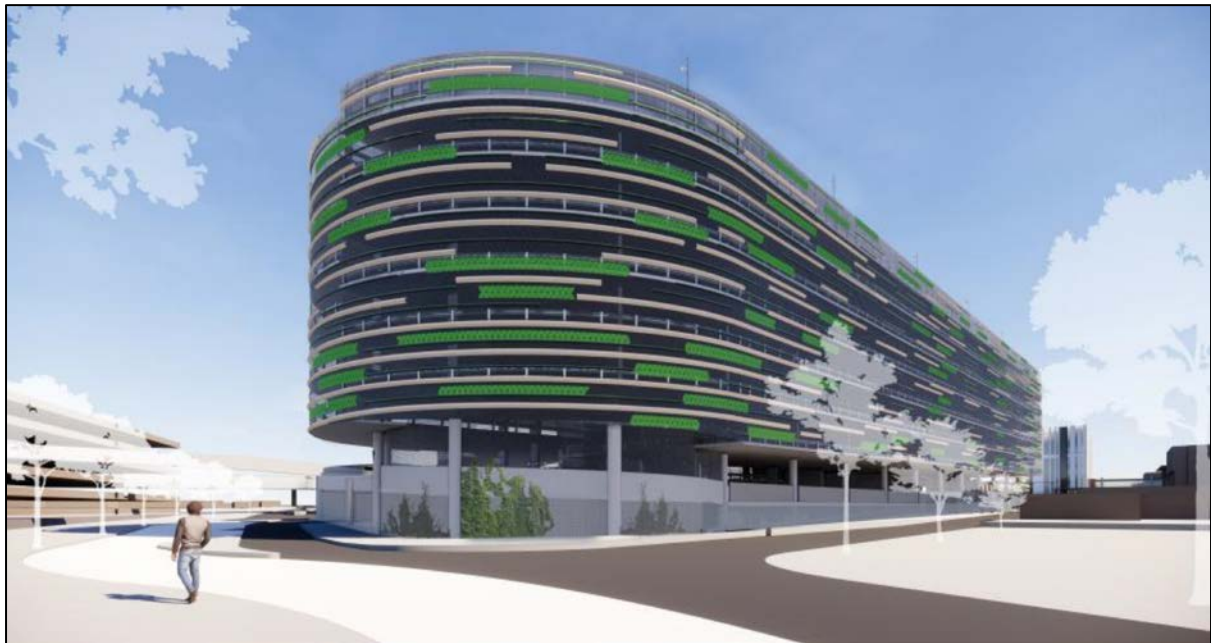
| West elevation of carpark (with the additional level) (Source: Amended proposal)
